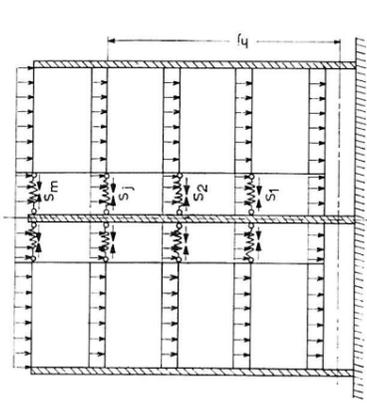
Design diagram of an inner transverse wall of a large-panelled building at bending in plane.
